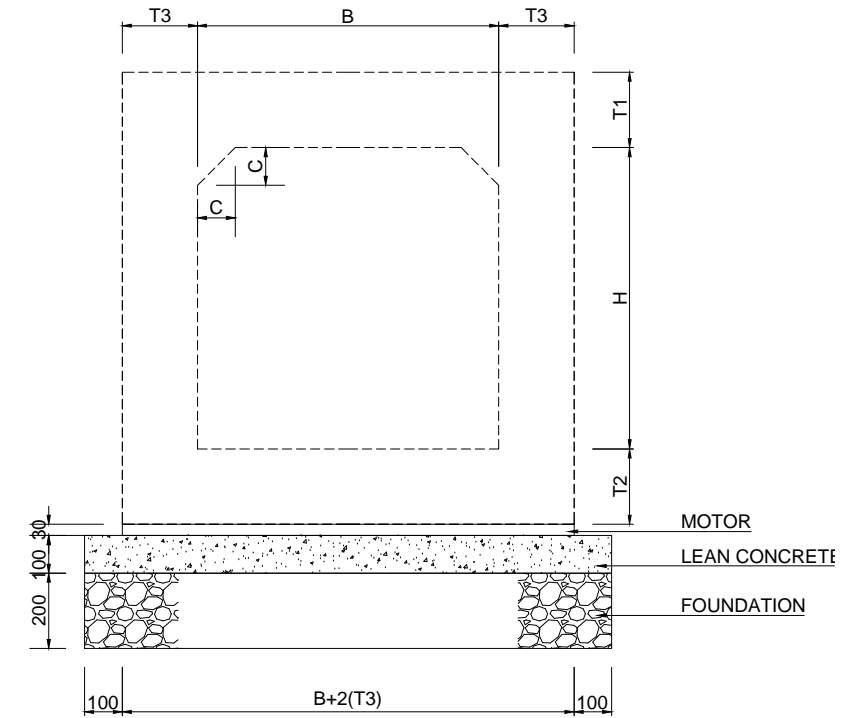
DETAIL OF BOX CULVERT FOR ROAD ACCESS
